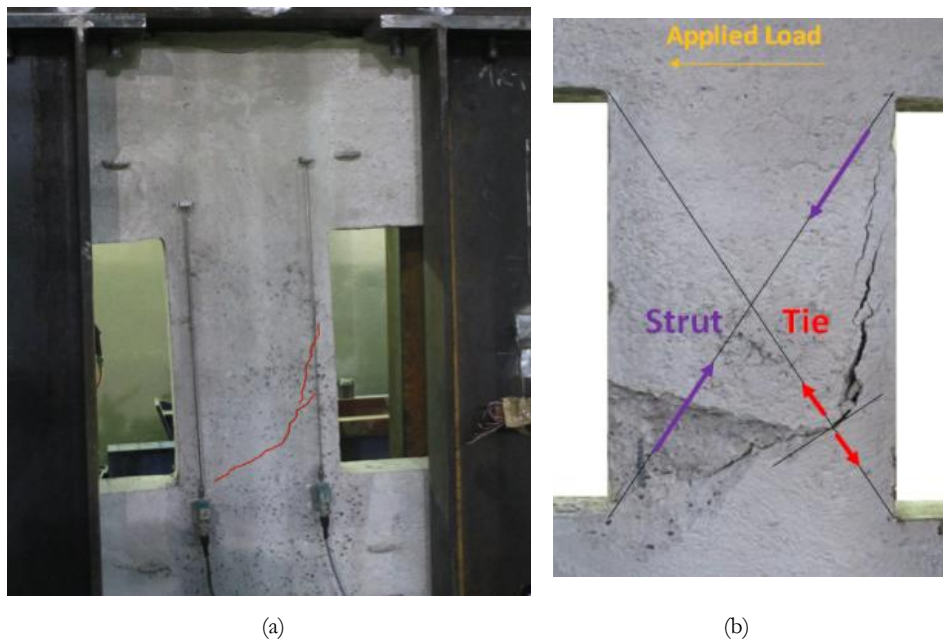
Coupling beam with longitudinal reinforcement: (a) crack initiation and (b) crack propagation and failure of the specimen
